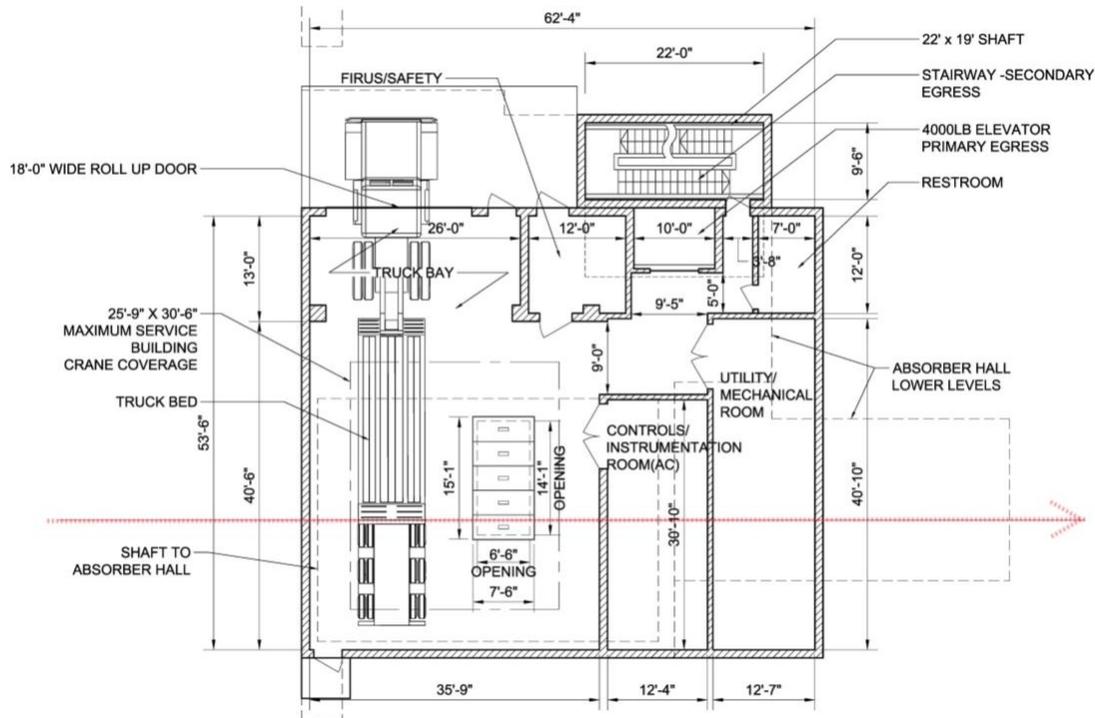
Absorber Service Building (LBNE 30) Floor Plan.
